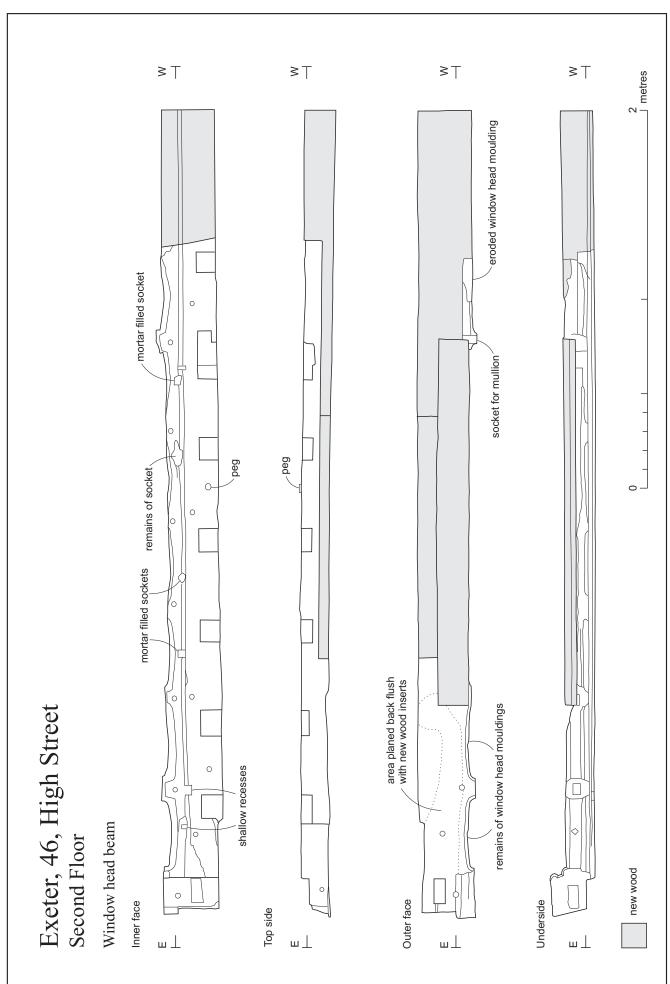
Window head beam from second floor north façade during renovation. Scale 1:20.
